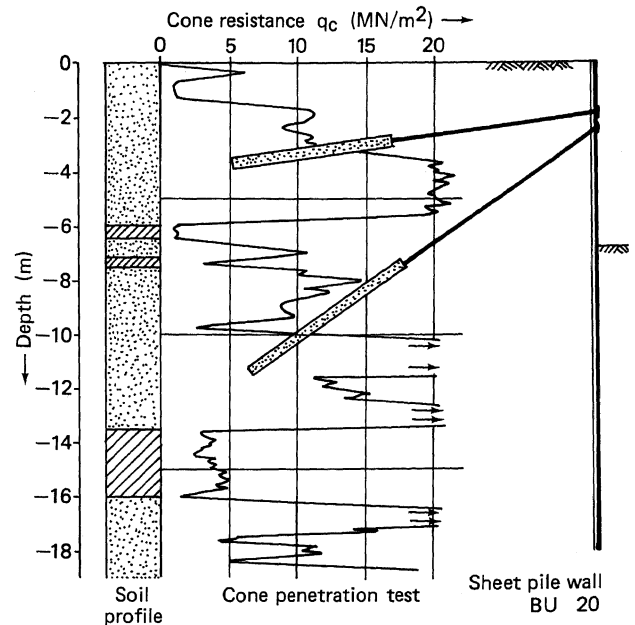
Construction and Soil Profile Sheet Pile Wall
